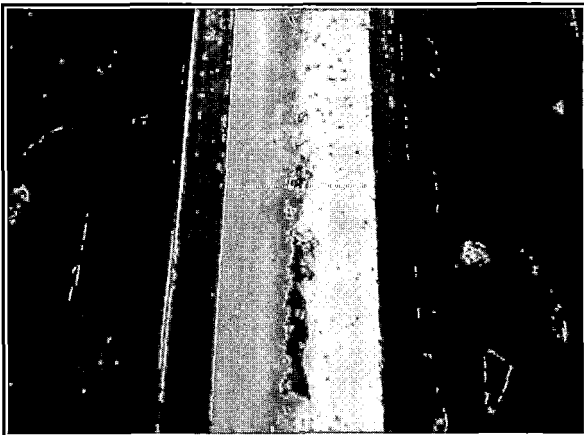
Spalling of Section 03 Low Rail in the Wood Tie Zone after 50 MGT
